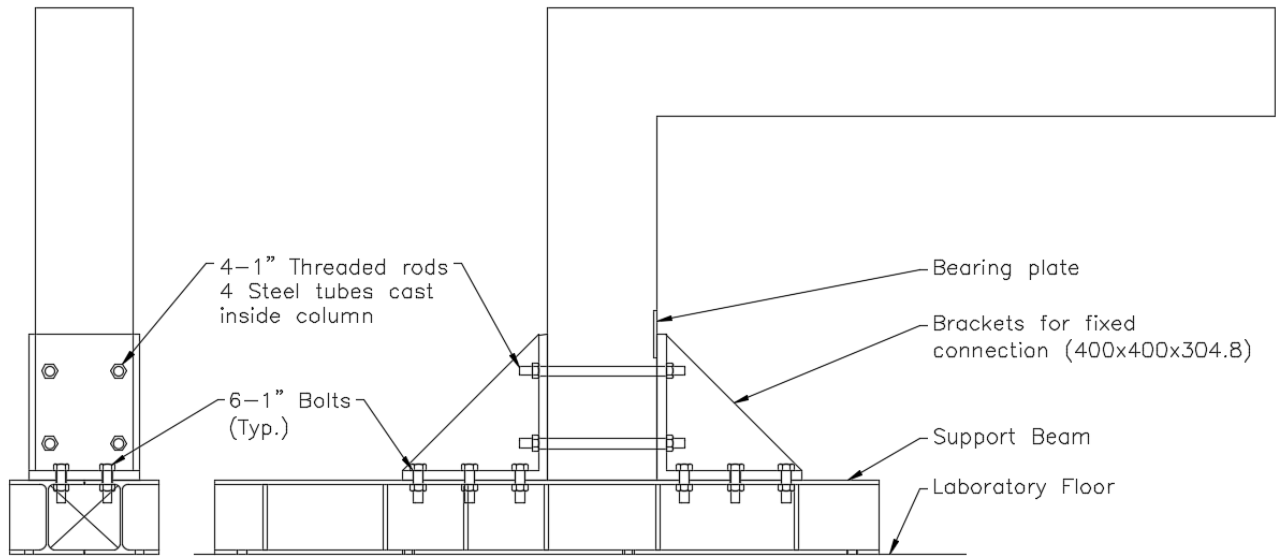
Fixed Support Details, North Face (left) and West Face (right)
